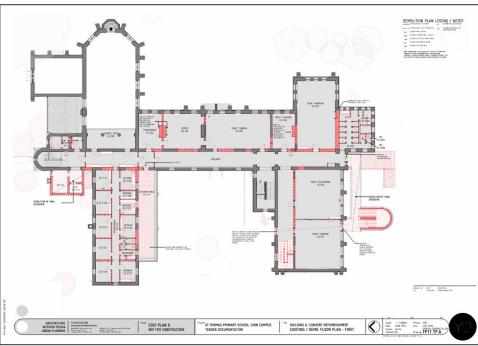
First floor demolition plan (Source: Y2 Architecture)
